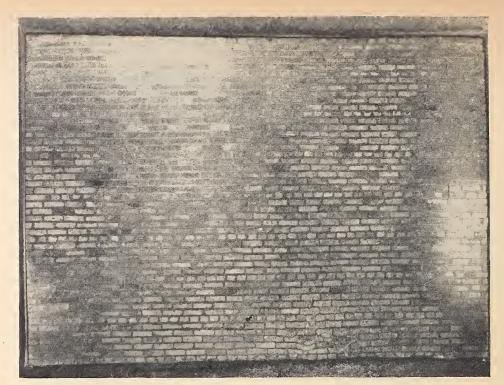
Fire-exposed side of 8-in. concrete-brick wall 25 after 6-hr fire test.
